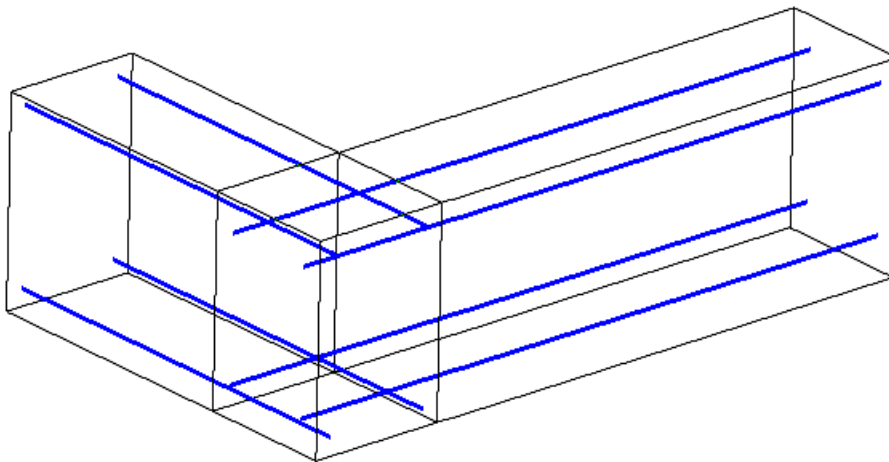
L-shaped cantilever beam. Dimensions in mm.
